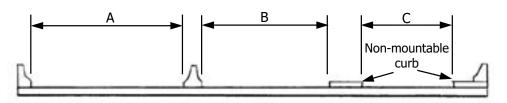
Cross-section view of a bridge deck with non-mountable curb and median barrier.
